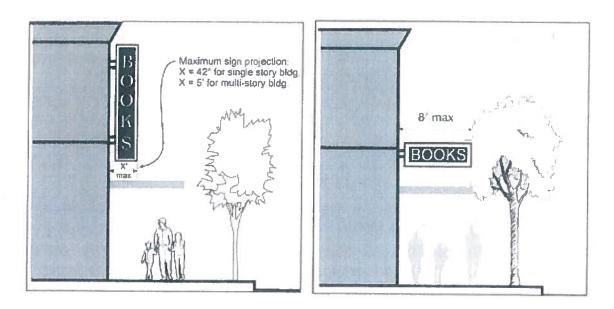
(D-1). Standards for vertically (left) and horizontally oriented (right) projecting signs.
